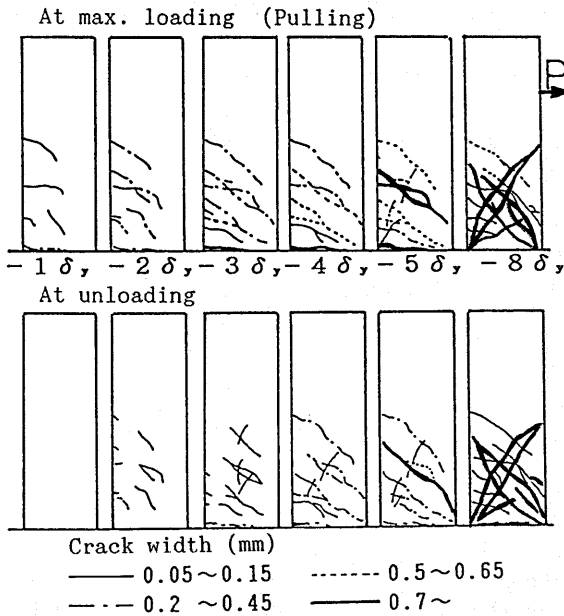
Cracks in the columns under static loading at various displacements
